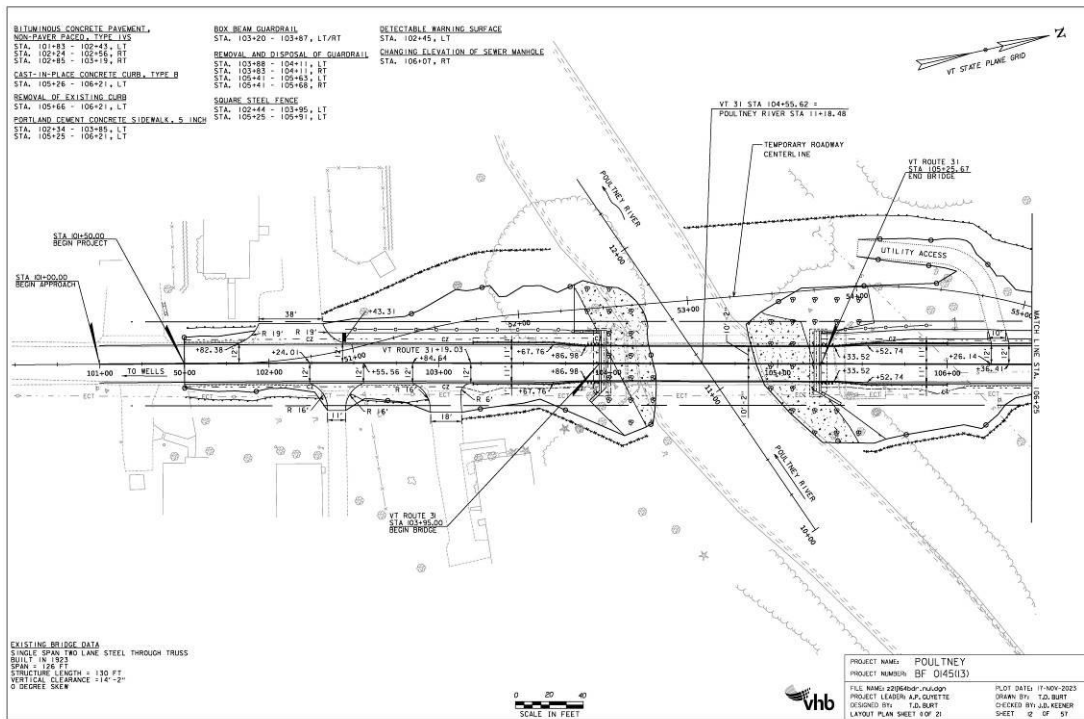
Layout Plan Sheet 1 of 2, Preliminary Plans, November 2023.
